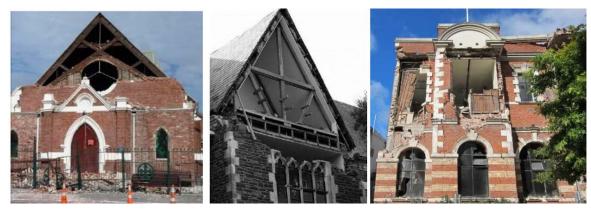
Out-of-plane failure and collapse of unreinforced masonry gable end walls and external walls.
